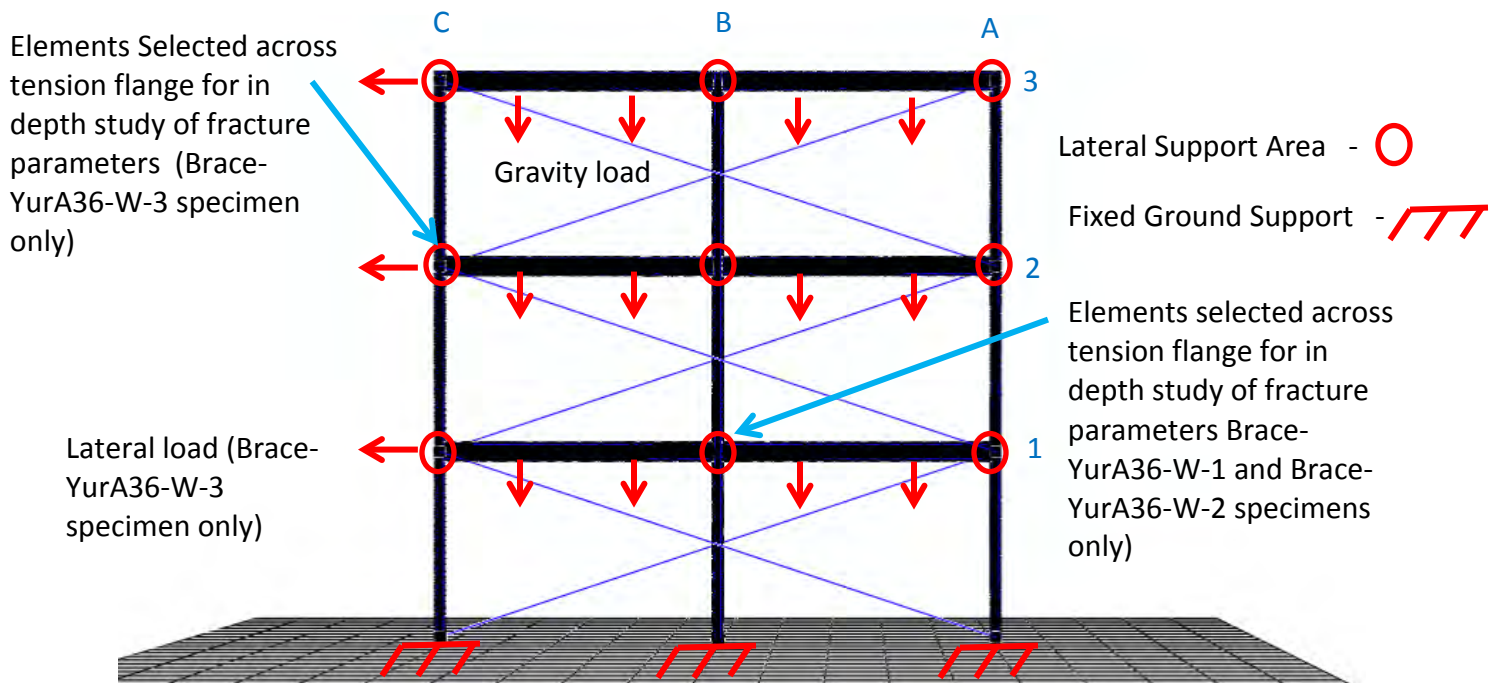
Finite element model with its boundary conditions, loading, and location of elements selected for study of fracture parameters for Brace-YurA36-W-1, Brace-YurA36-W-2, and Brace-YurA36-W-3 specimens
